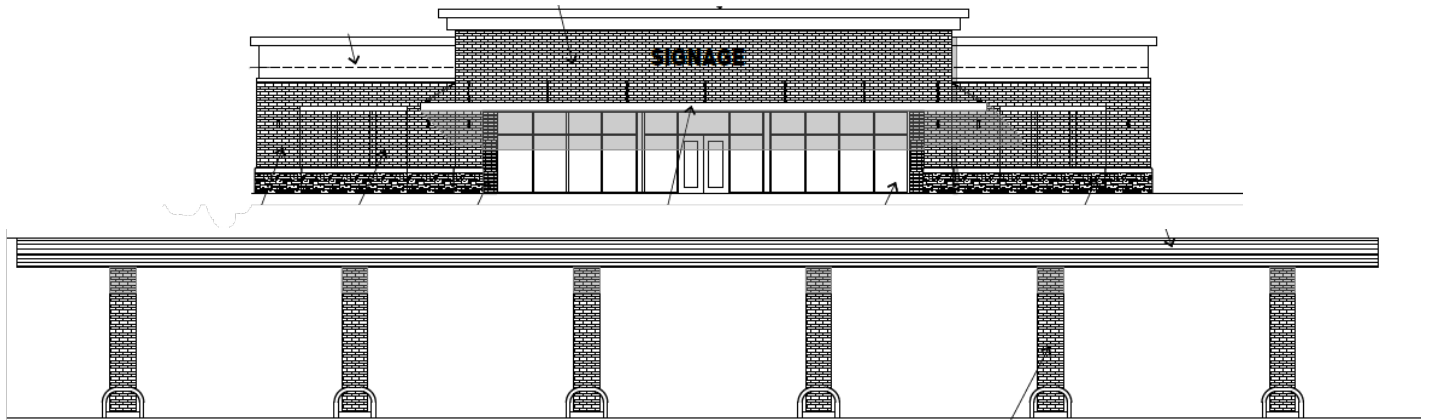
Elevation for the convenience store and gas station on Lot 5.
